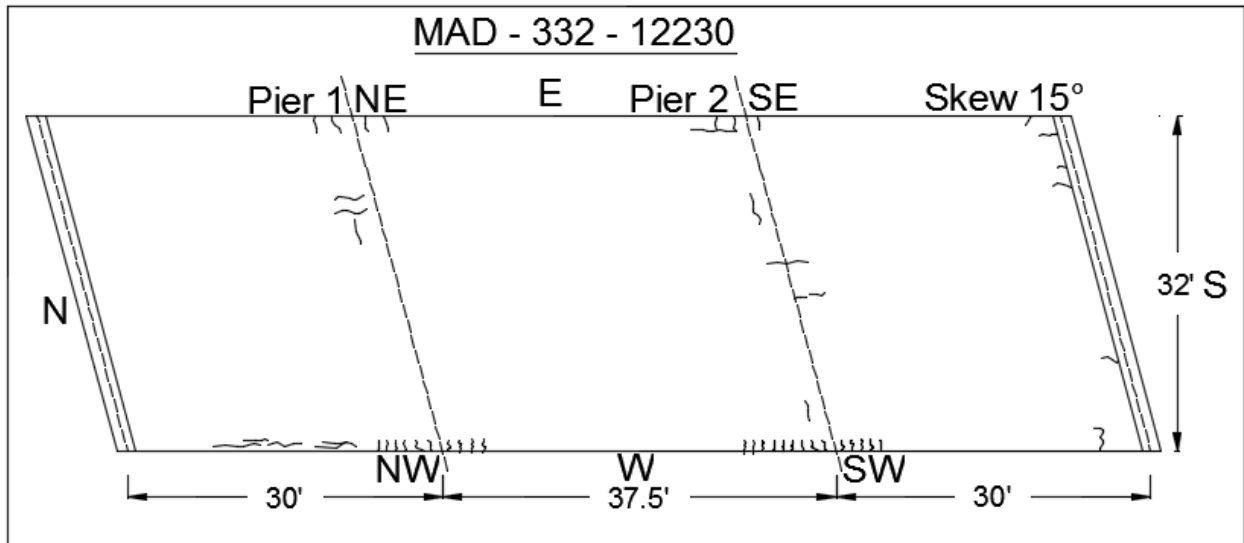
Bridge Inspection Pictures and Crack Map – MAD-323-12230
